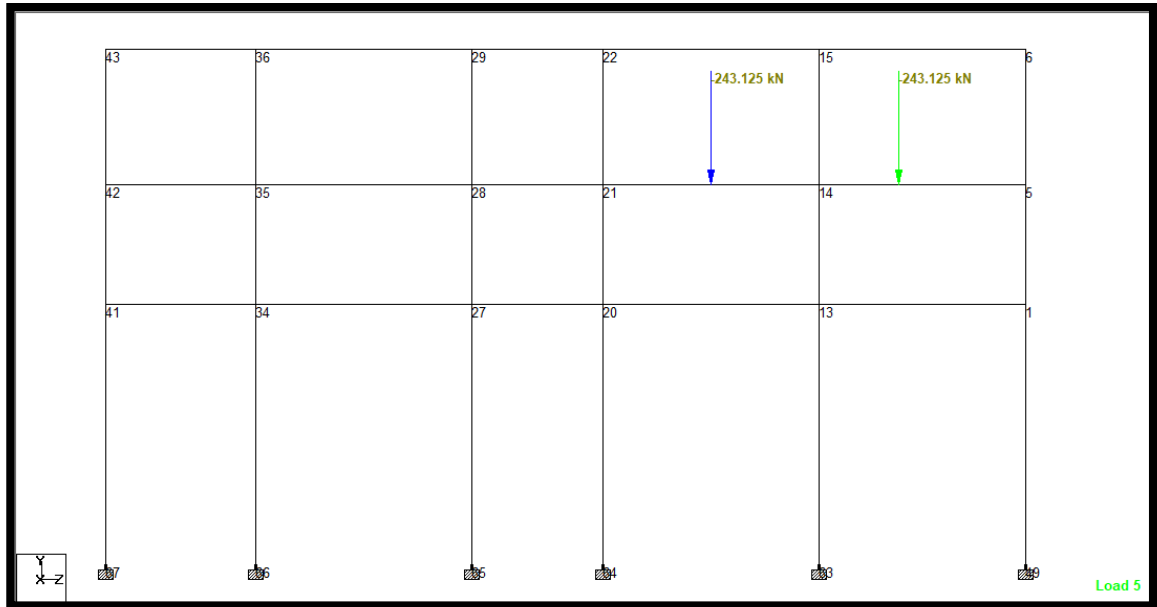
11 Crane wheel load on beam (Crane load-2)
